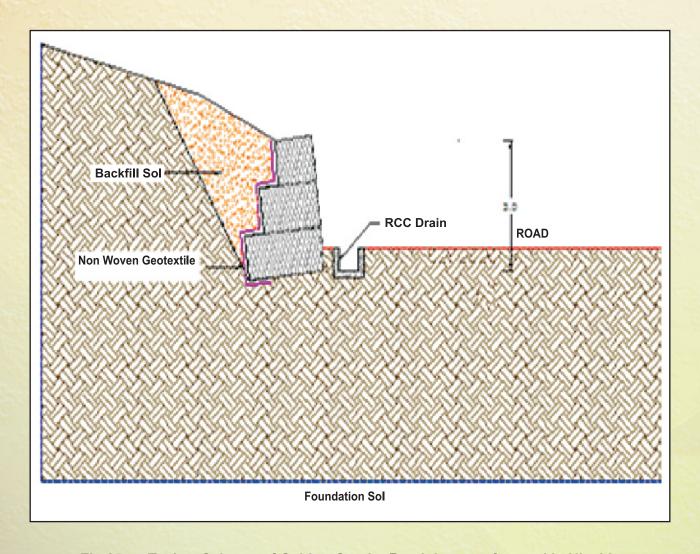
a: Typical Scheme of Gabion Gravity Retaining wall for road in Hillside
